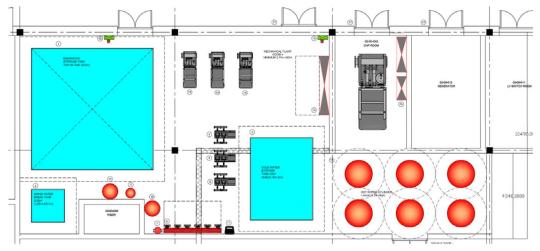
Proposed Hotel Ground Floor Plant Area
